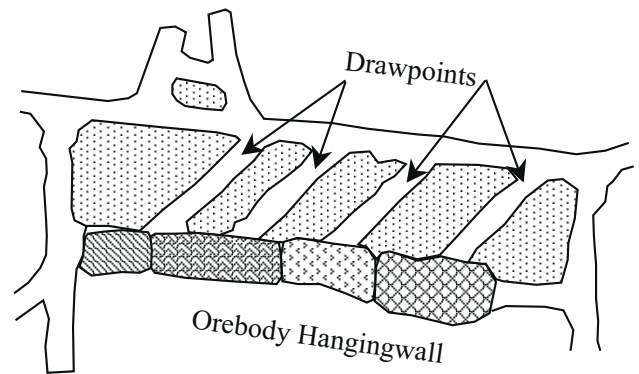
A plan view of a fixed drawpoint geometry in sublevel stopping.
